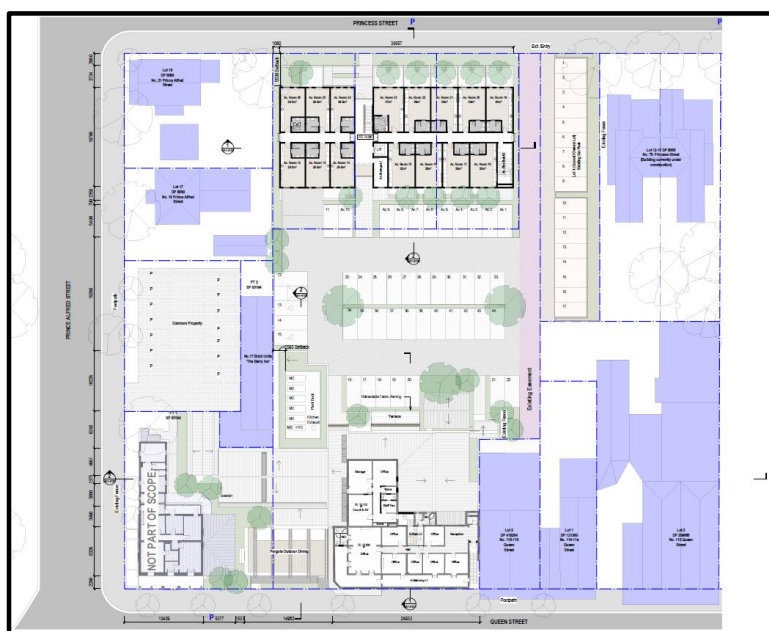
Ground floor plan of the proposed development (Source: H&E Architects).
